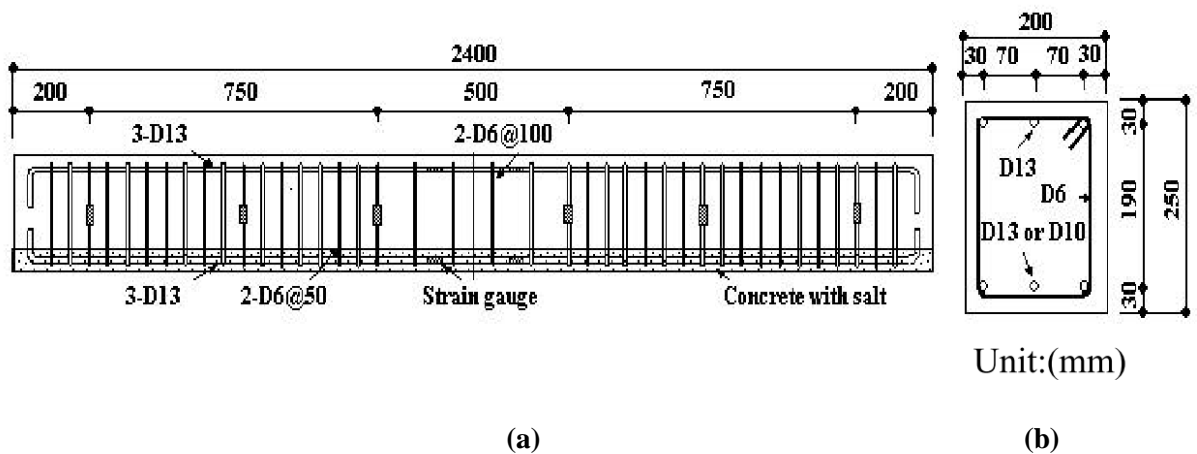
Details of the RC beam considered (Lee *et al.*, 1999) (a) Elevation (b) Cross section
